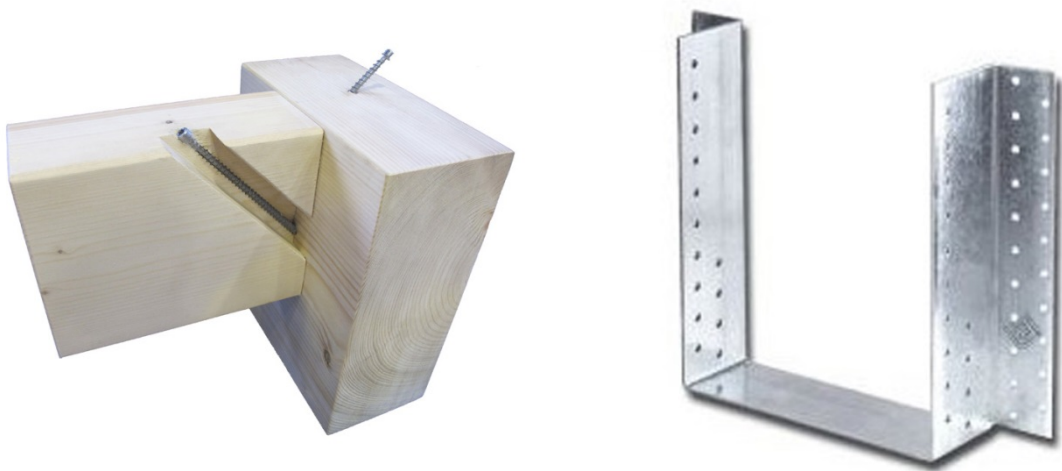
Examples for connections with joist hangers or pairwise crossed full thread screws. (source: GH Bau-beschläge)
